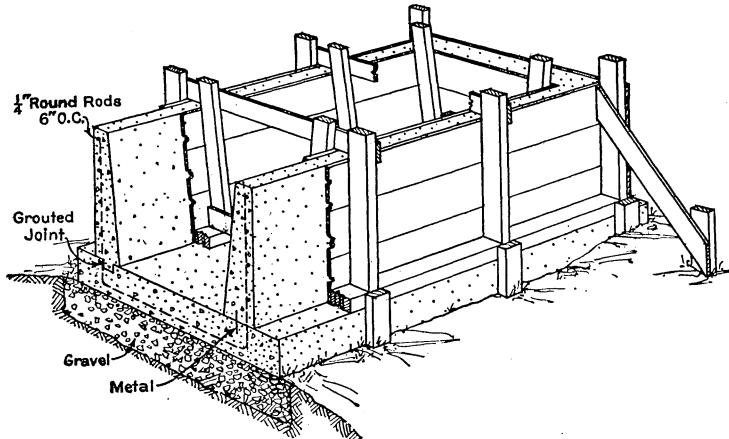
Method of constructing rectangular trough on cushion. Watertight joints made with 6-inch strip of galvanized metal or grouted tongue and groove
